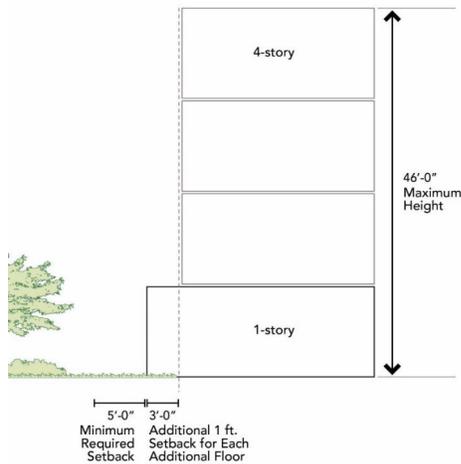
R-1 Corner Lot Side Setbacks
